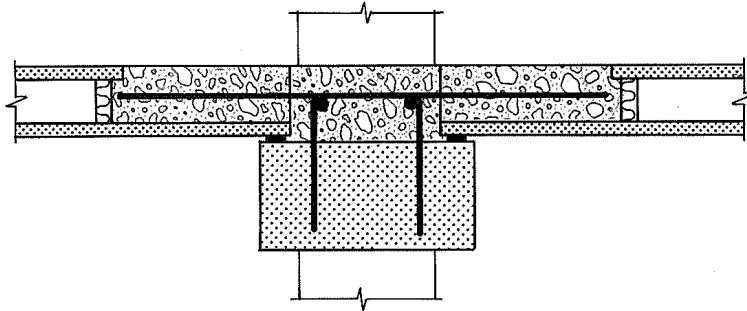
Connection for prefabricated concrete elements, connecting two floor elements upon a beam, from FIP (1988).
